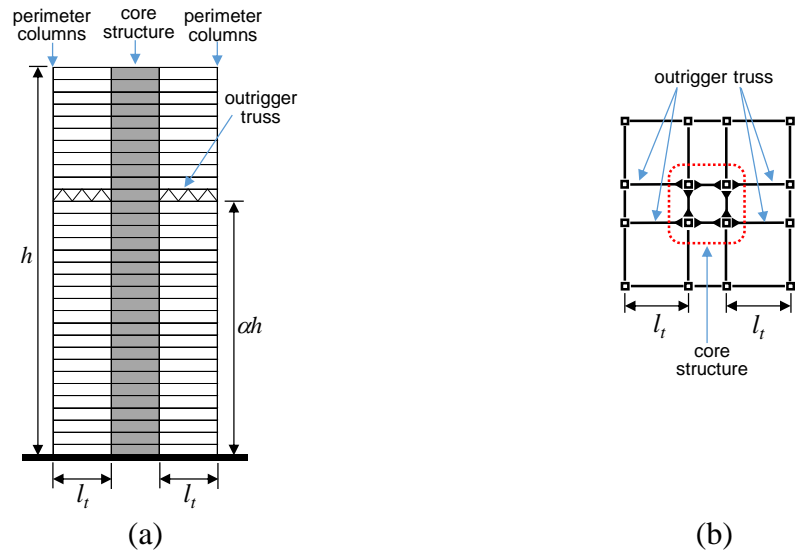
The (a) elevation and (b) floor framing plan on outrigger floor of structure with a single layer of outrigger
